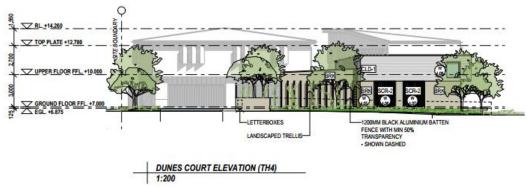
Elevation from Dunes Court of amended 4 unit proposal
